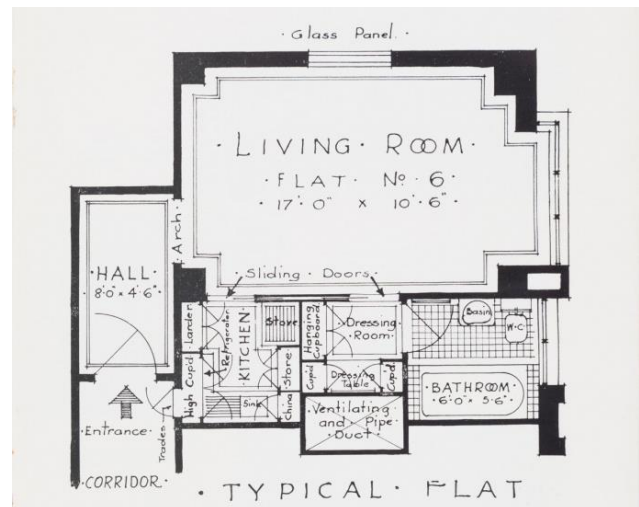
Typical layout of bachelor flat in 7 Elizabeth Street
